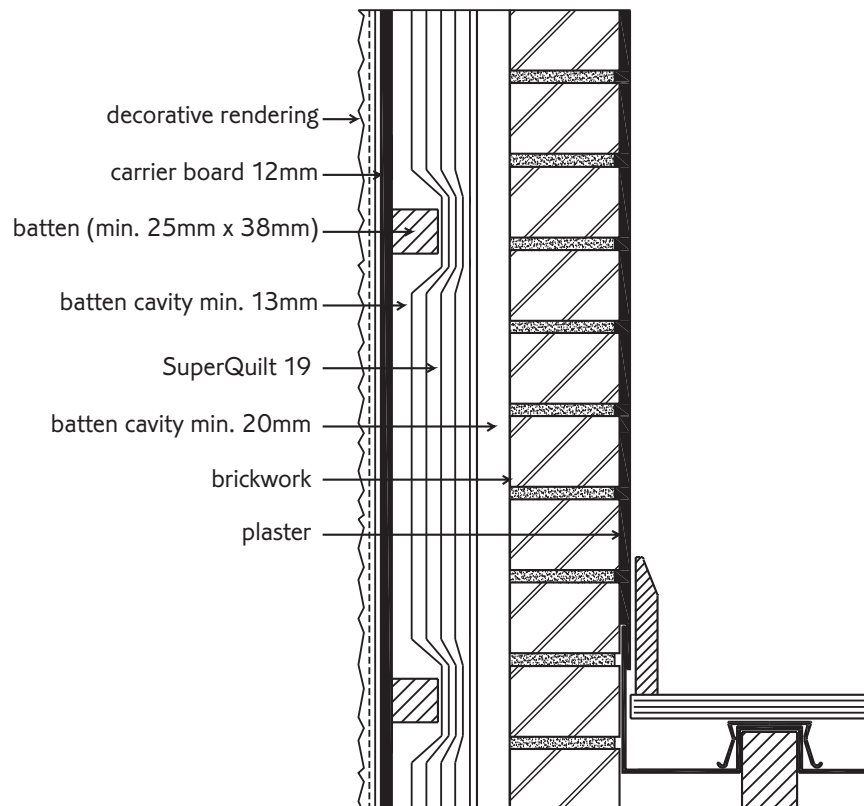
Typical external wall insulation application with SuperQuilt 19
